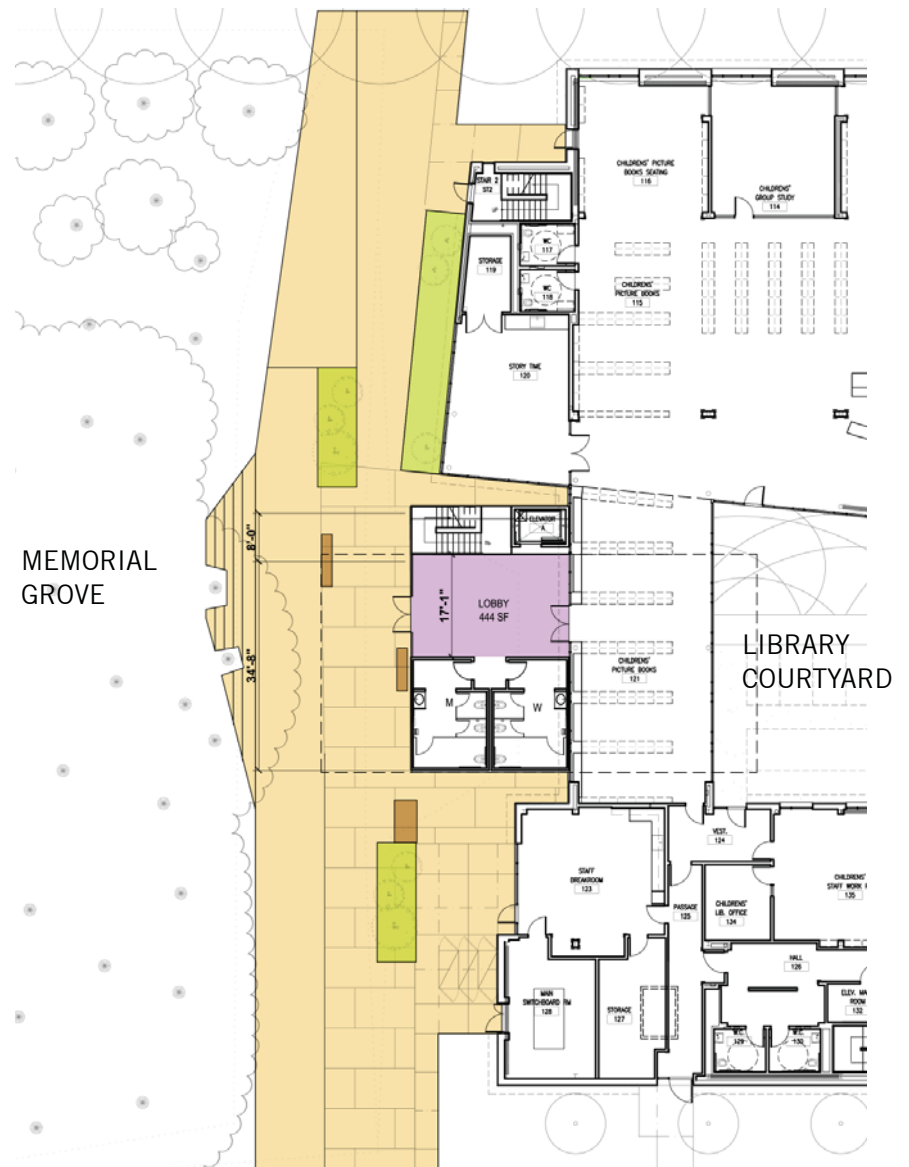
Conceptual ground floor plan of the 'Perch' Addition
